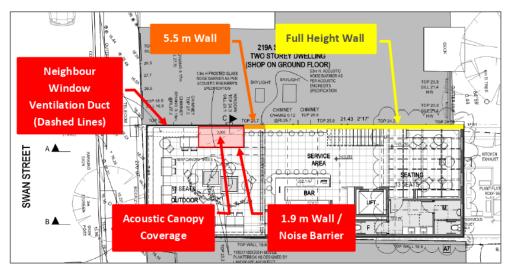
Locations of Walls / Noise Barrier at Boundary of Roof Terrace (Image Source: YBL Remmus Architecture)
